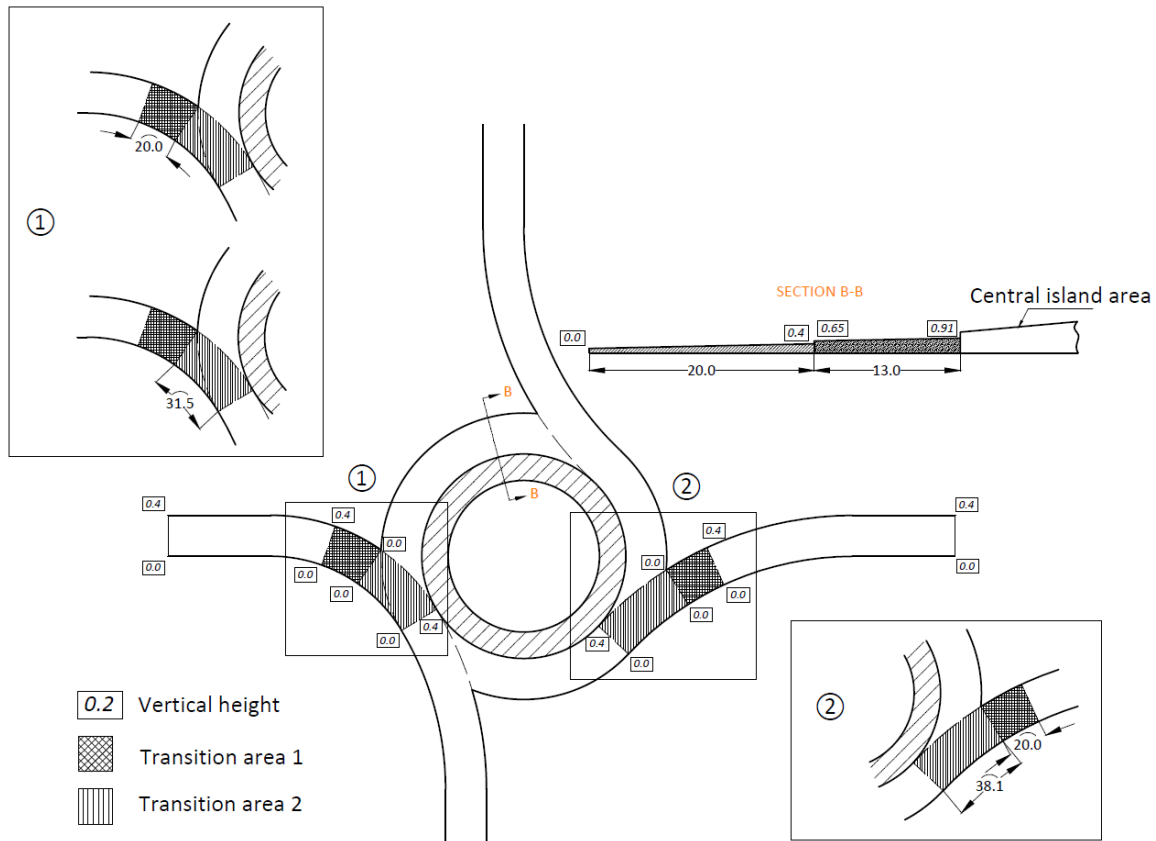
Cross-sectional geometry of 140-ft baseline single-lane roundabout model (Unit: ft).
